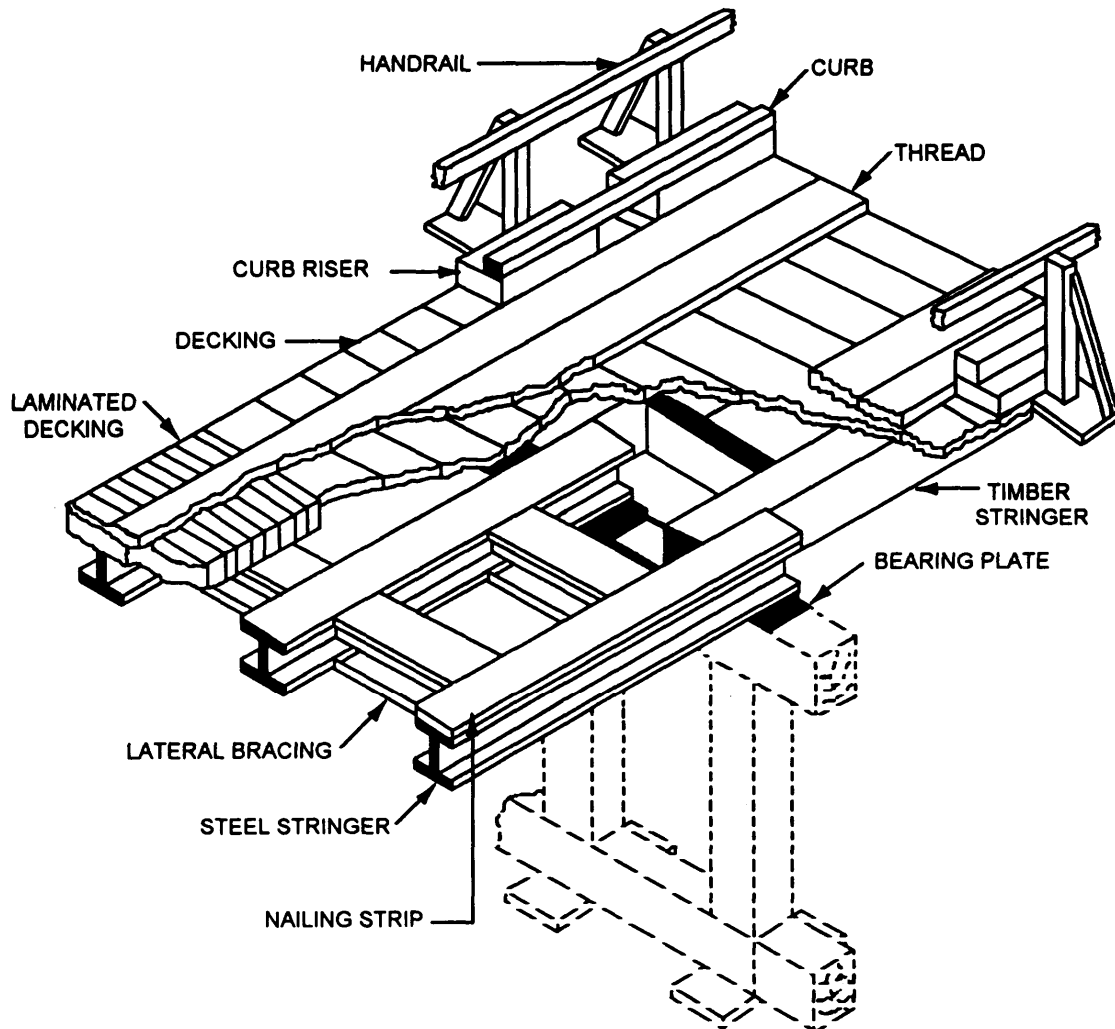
Nomenclature of a fixed highway bridge superstructure.
